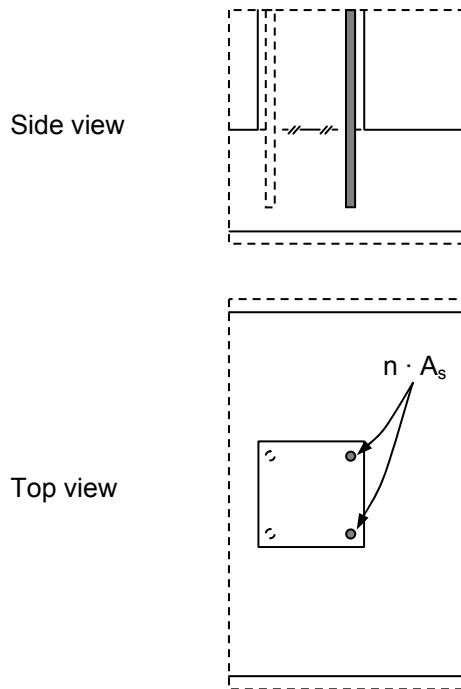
Cross section area  $A_s$  for linear arranged starter bar anchorages of column-to-foundation connections
